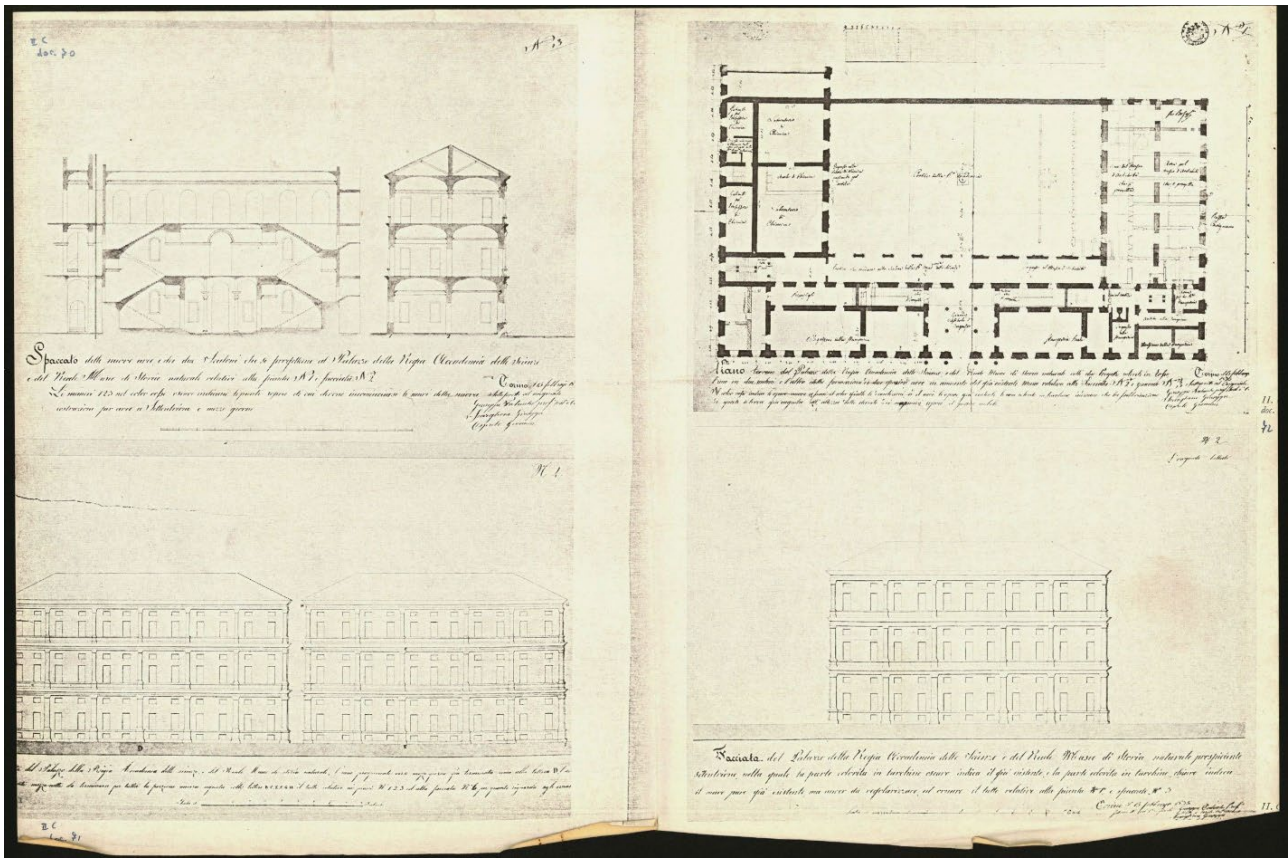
Plans, elevations and sections of the *Palazzo del Collegio dei Nobili* (1773). State Archive of Turin.
